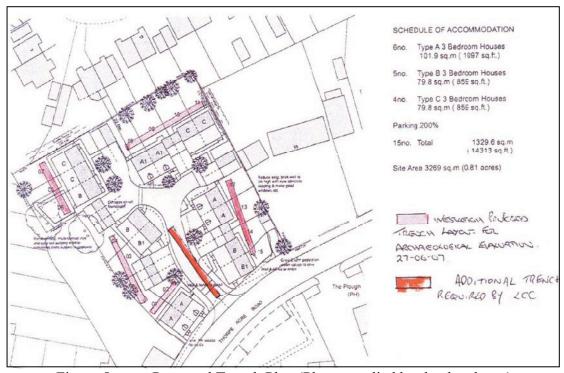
Proposed Trench Plan (Plans supplied by the developer)
